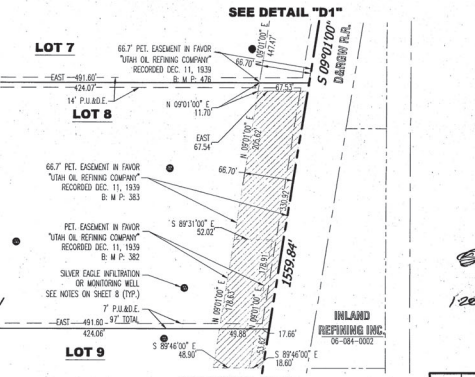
" (SALT LAKE PIPELINE COMPANY)
